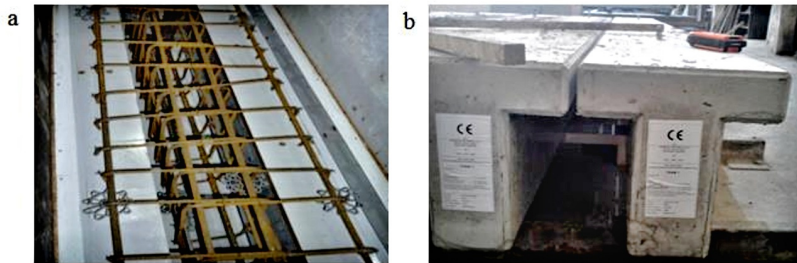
(a) Reinforcement in the mould; (b) Concrete T-beam.
